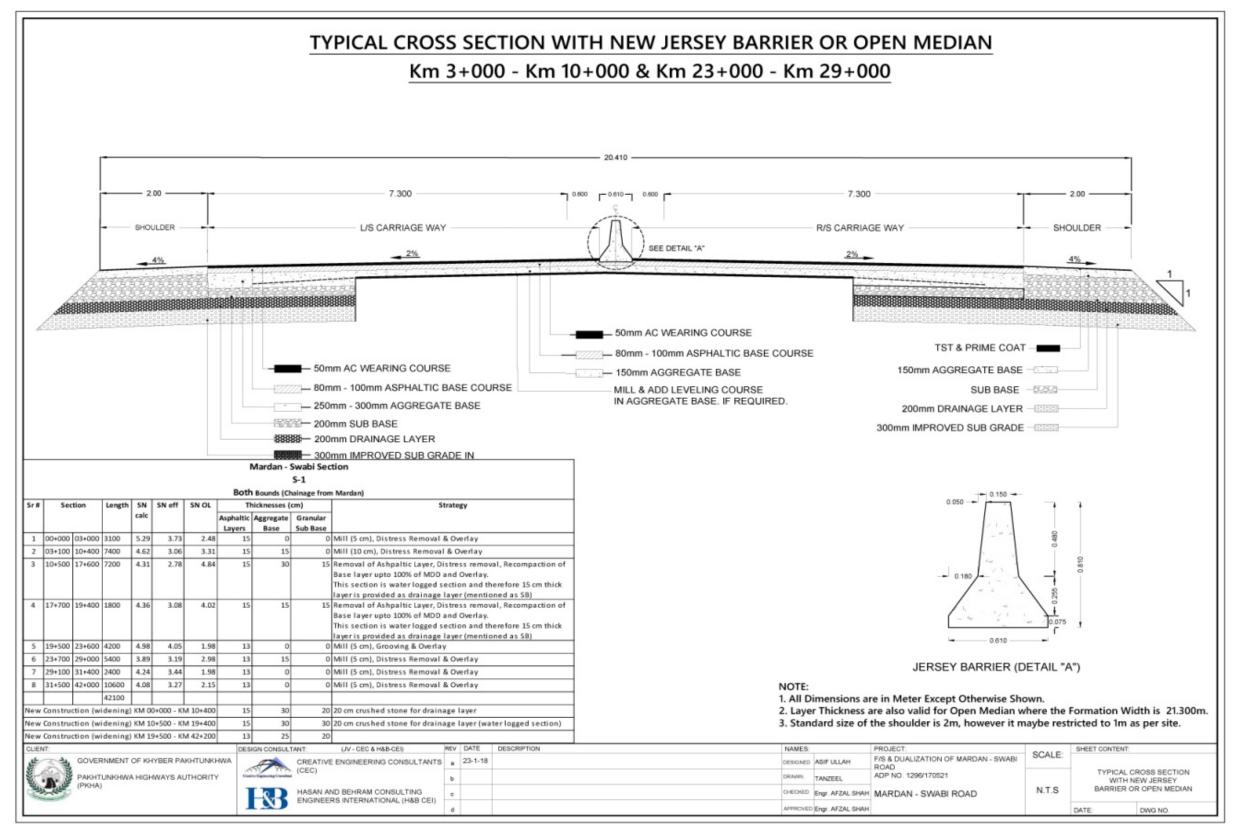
Typical Cross Section with New Jersey Barrier (km 3+00-km 10+00 & 23+000-km 29+000)
